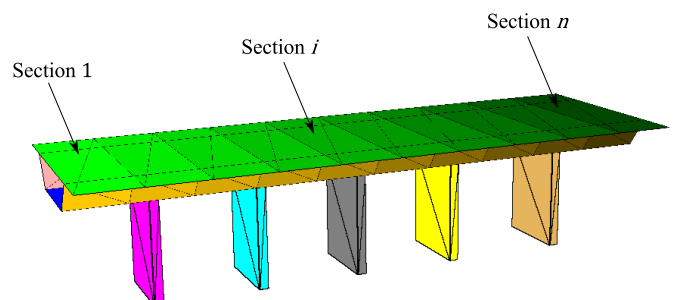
Sections defining the element size of the deterioration model of the box girder. Each section consists of four elements: a deck plate, a bottom flange and two webs.
